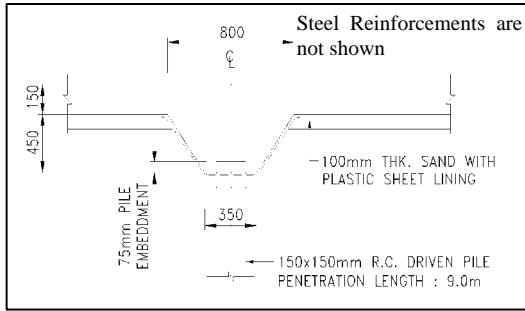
Cross-section of strip raft foundation system. (Tan, et al. 2004 (b))
